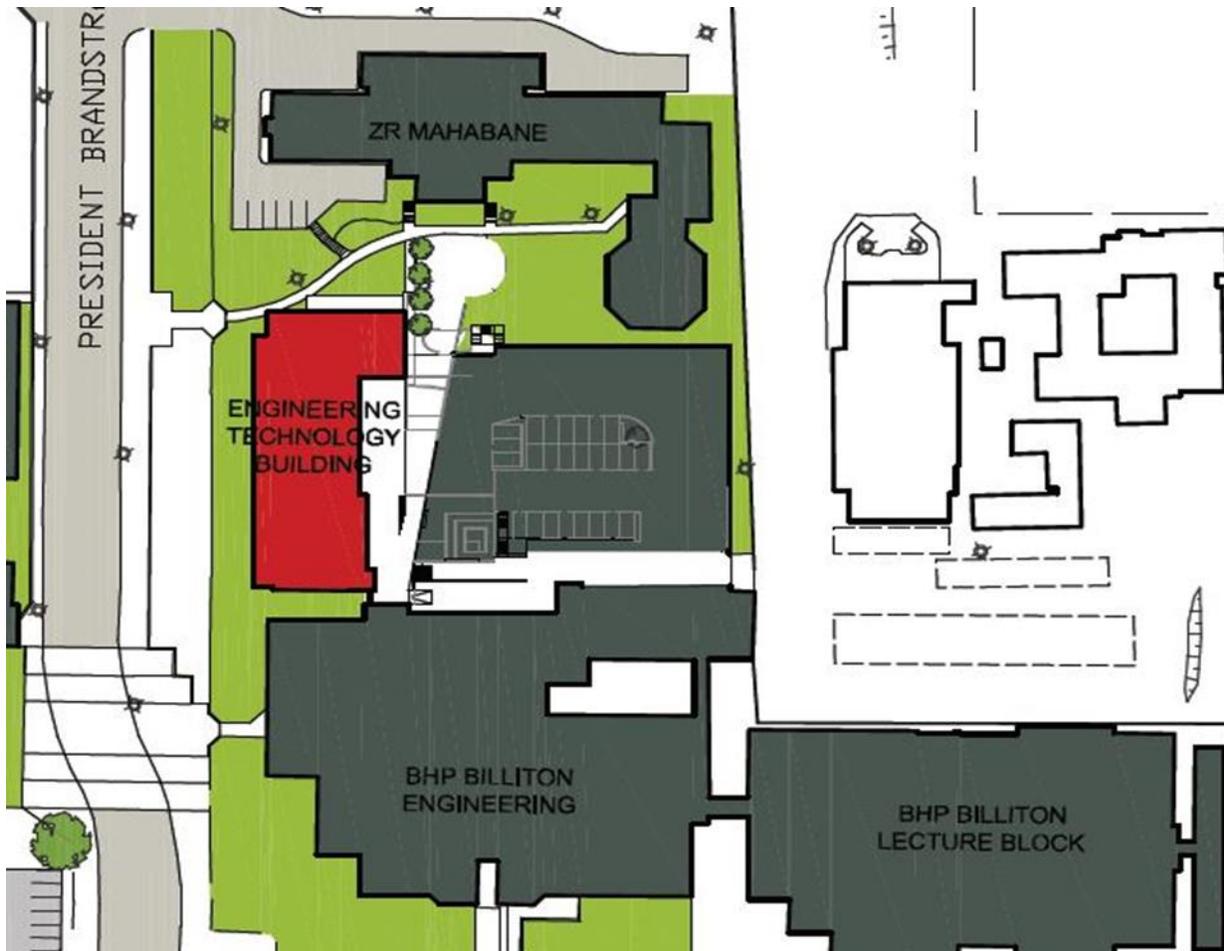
Locality plan around the Engineering Technology Building (ETB) on the Central University of Technology (CUT) campus in Bloemfontein with the case study building encircled
